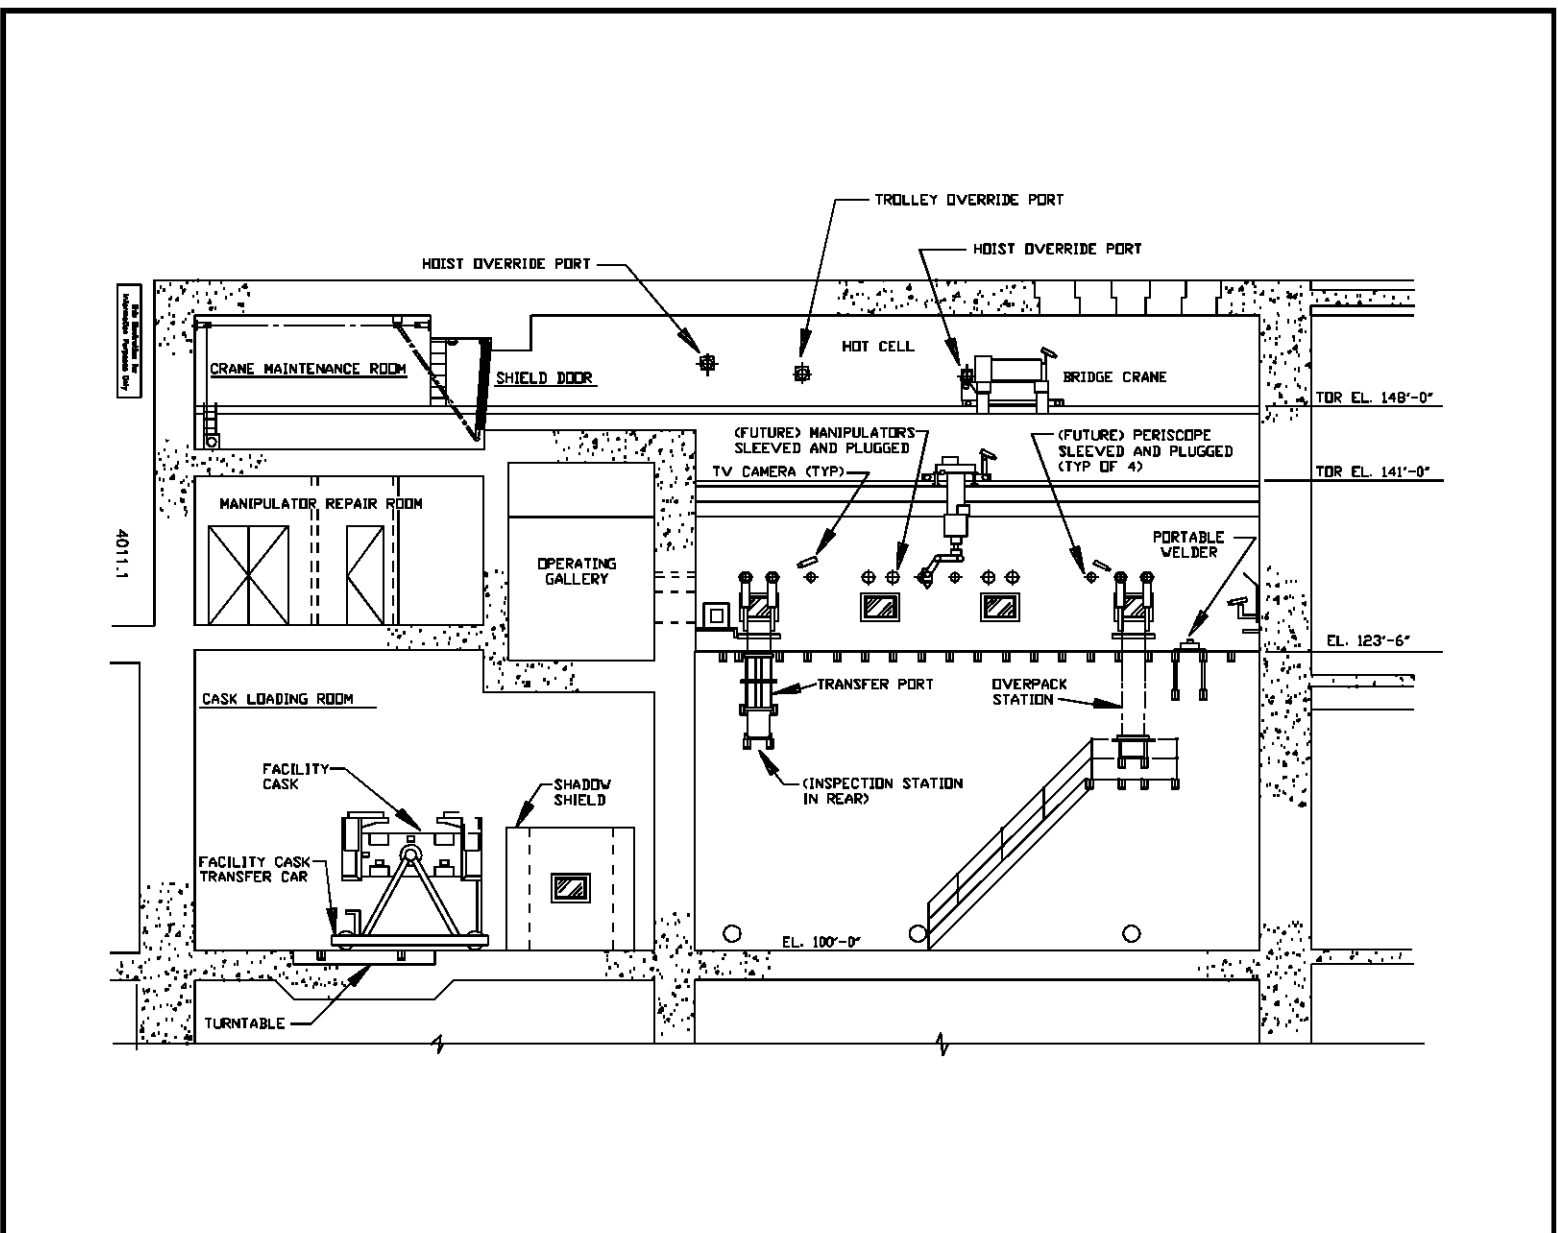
Details of Hot Cell Cross Section at D-D
